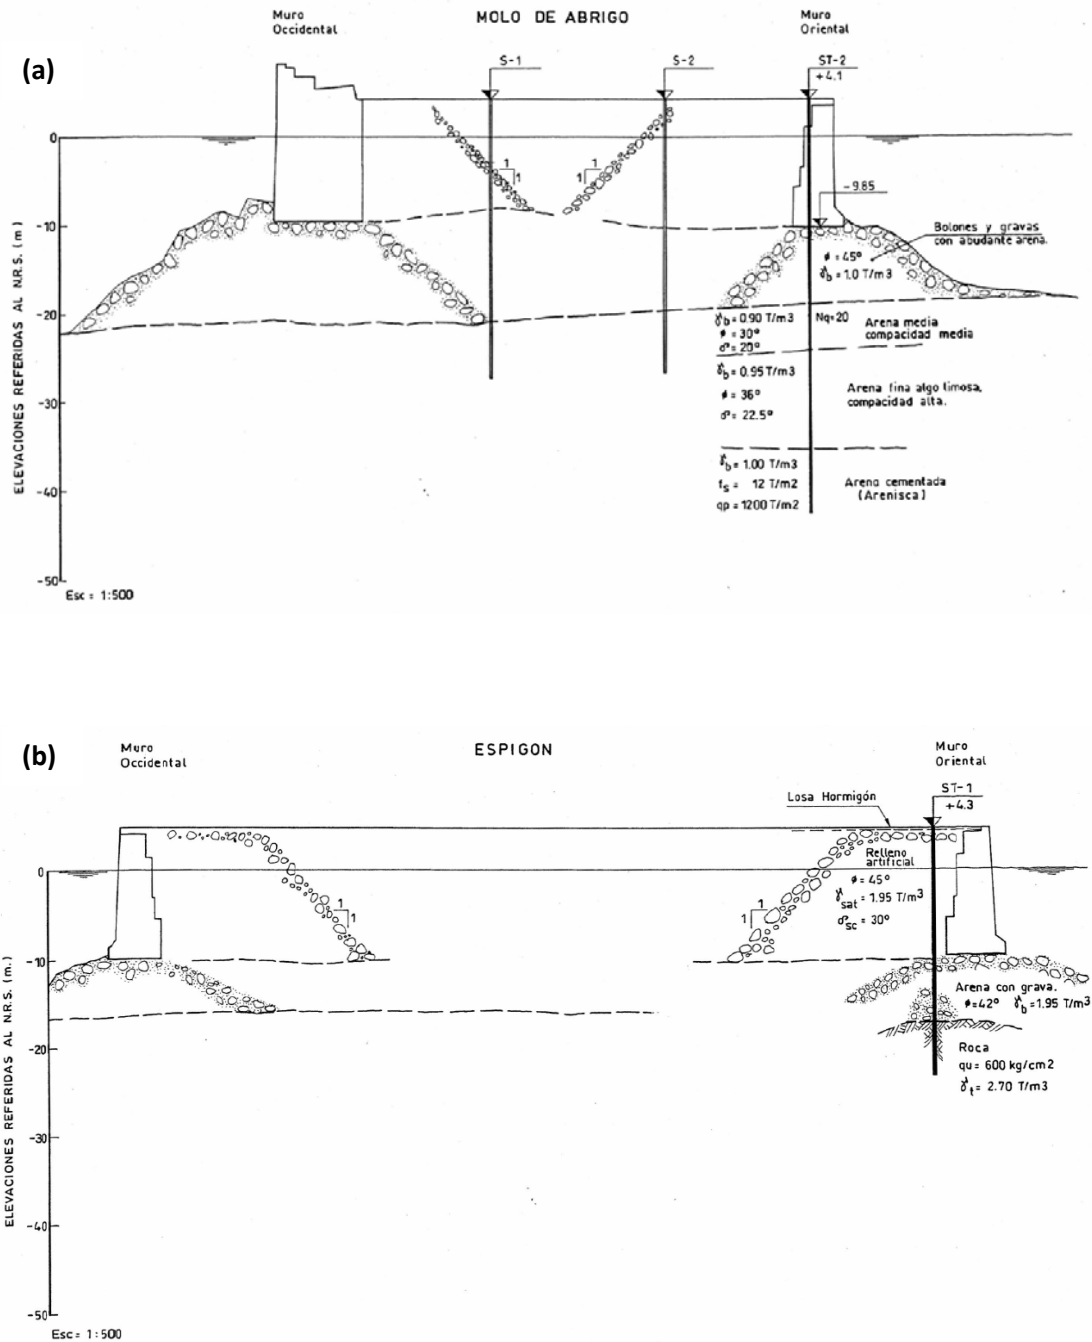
Typical cross-section through (a) the Molo pier and (b) Espigon pier. Large concrete blocks are placed on top of piles of gravel and boulders around the perimeter of the pier and backfilled with gravel and sand within the interior of the pier.
